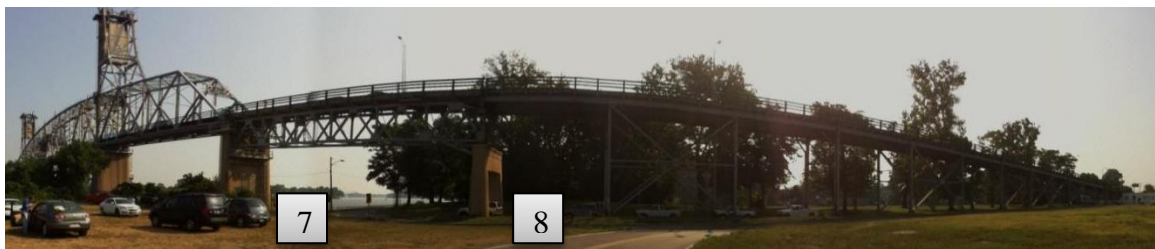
Panoramic Photo Showing Piers 7 and 8 as well as Column Supports of the NJ Approach
